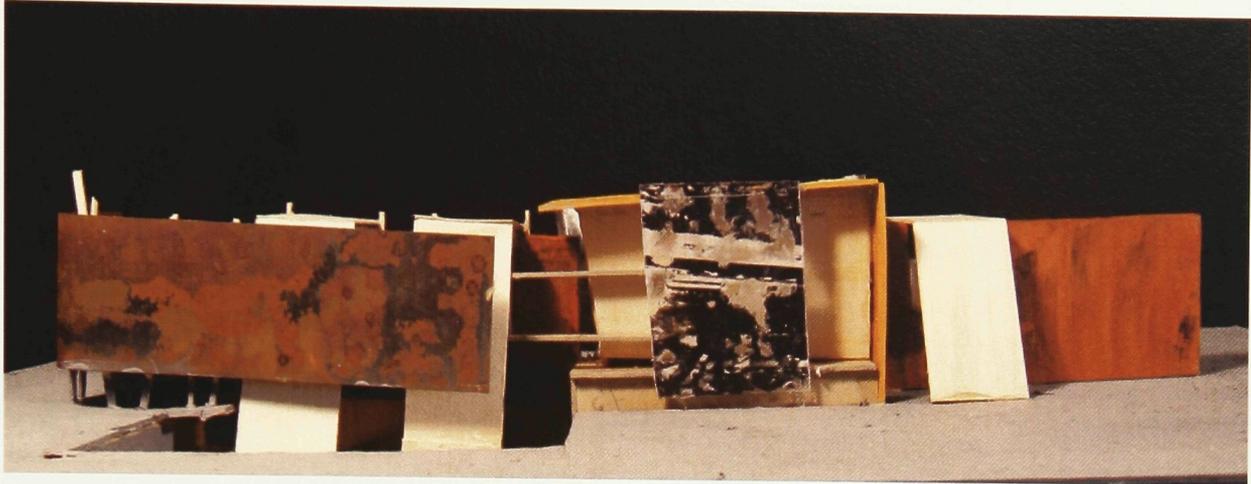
Elevation of building showing metal screen and elevated walkway.
